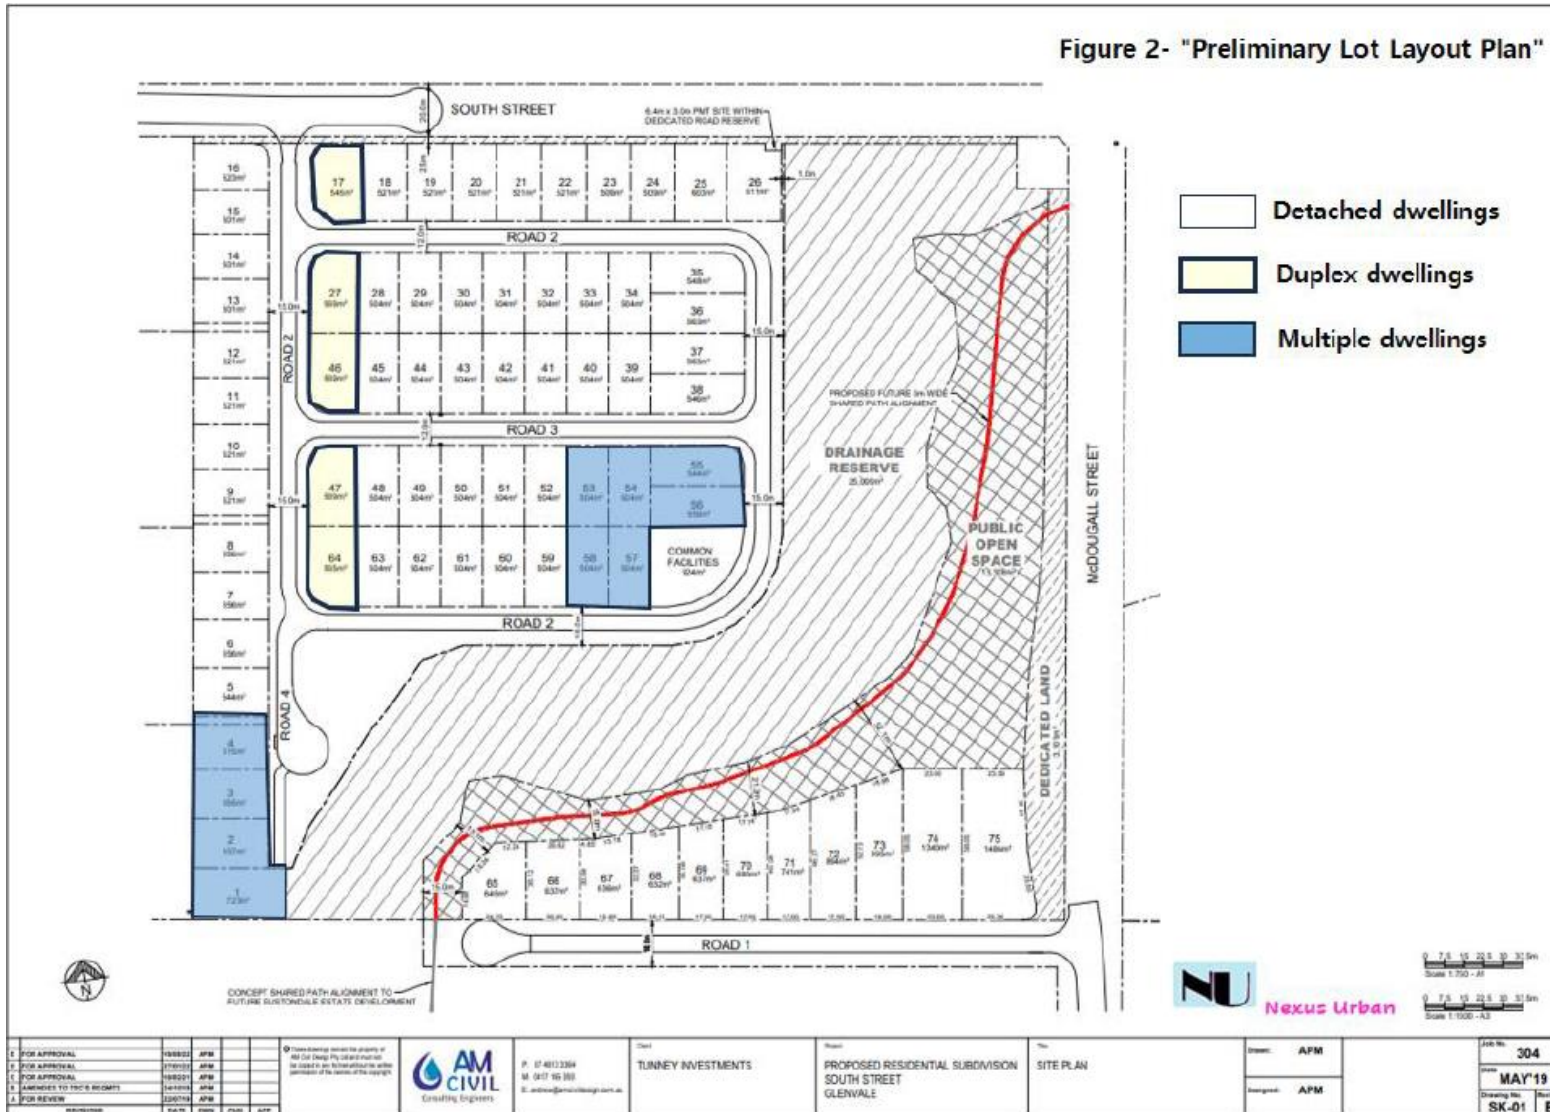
Proposed Site Plan, being Approved Site plan with annotations for “Detached dwellings”, “Duplex dwellings” and “Multiple dwellings”.
